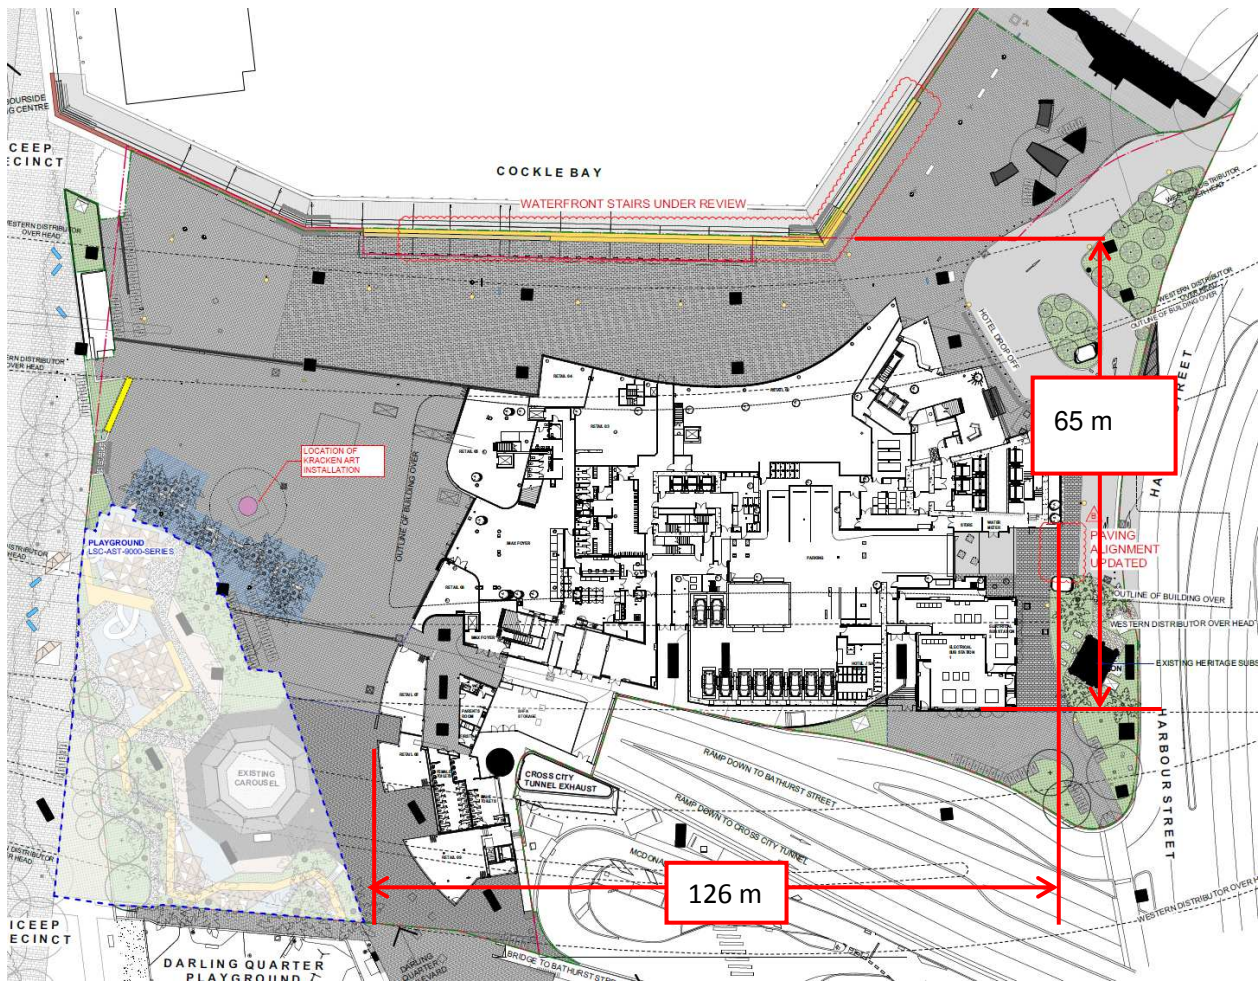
Ground level plan of the proposed development with approximate site dimensions.
